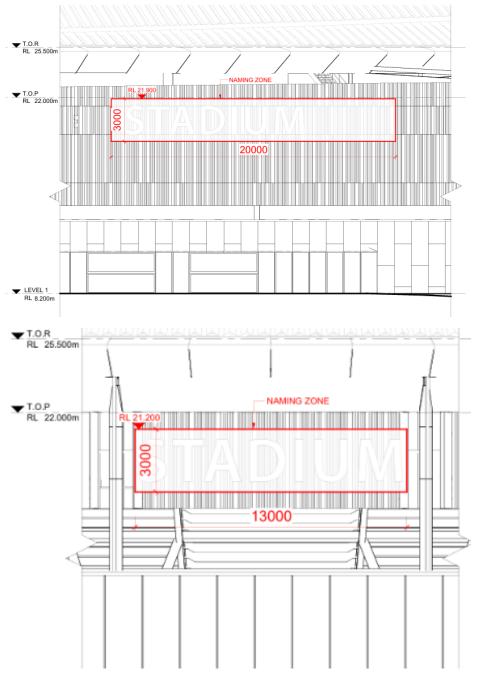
Extract from the Sign dimensions and elevation plan (source: Appendix A – Architectural Plans, Cox Architects)
